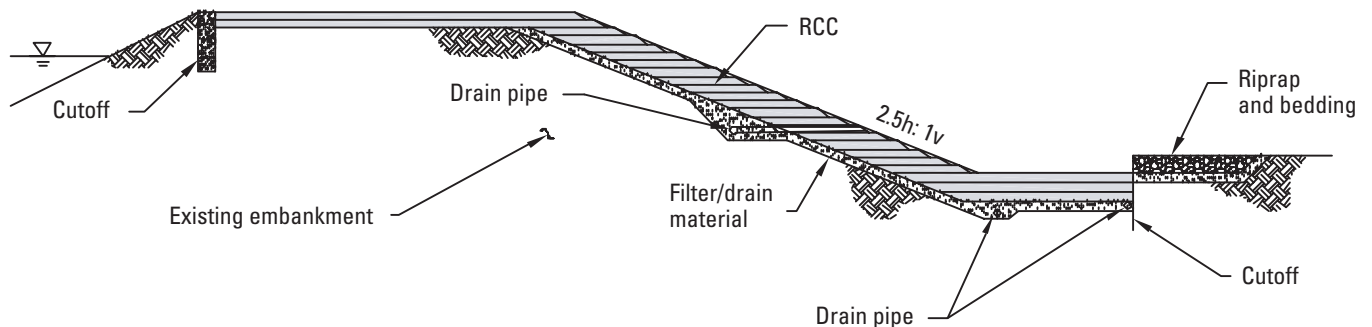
Typical RCC overtopping section with under-drain.
